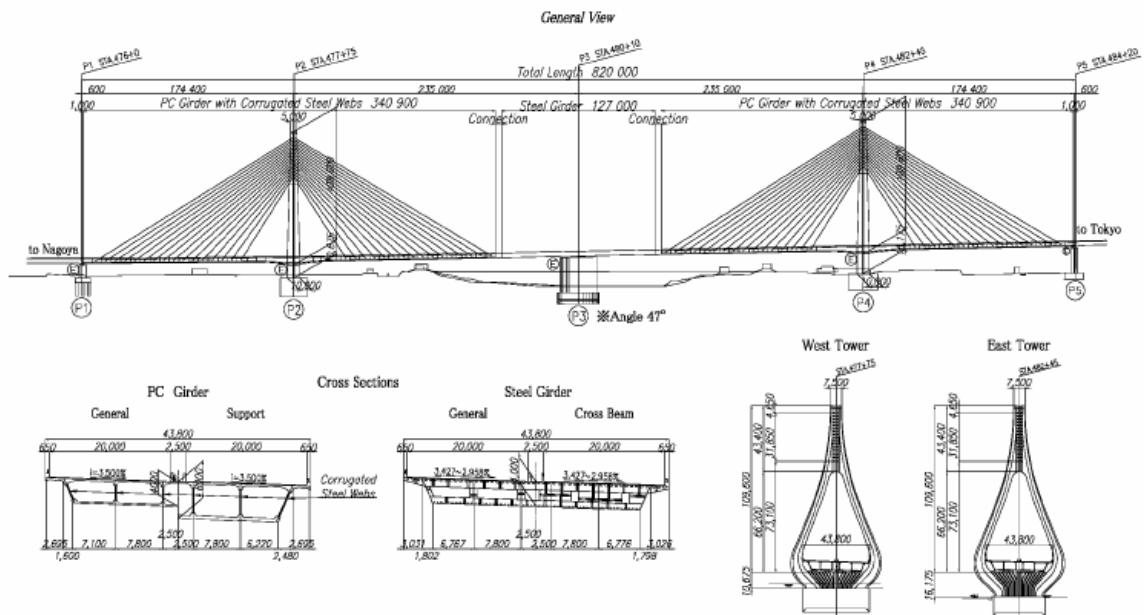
Side view and sections of YAHAGI-GAWA Bridge
